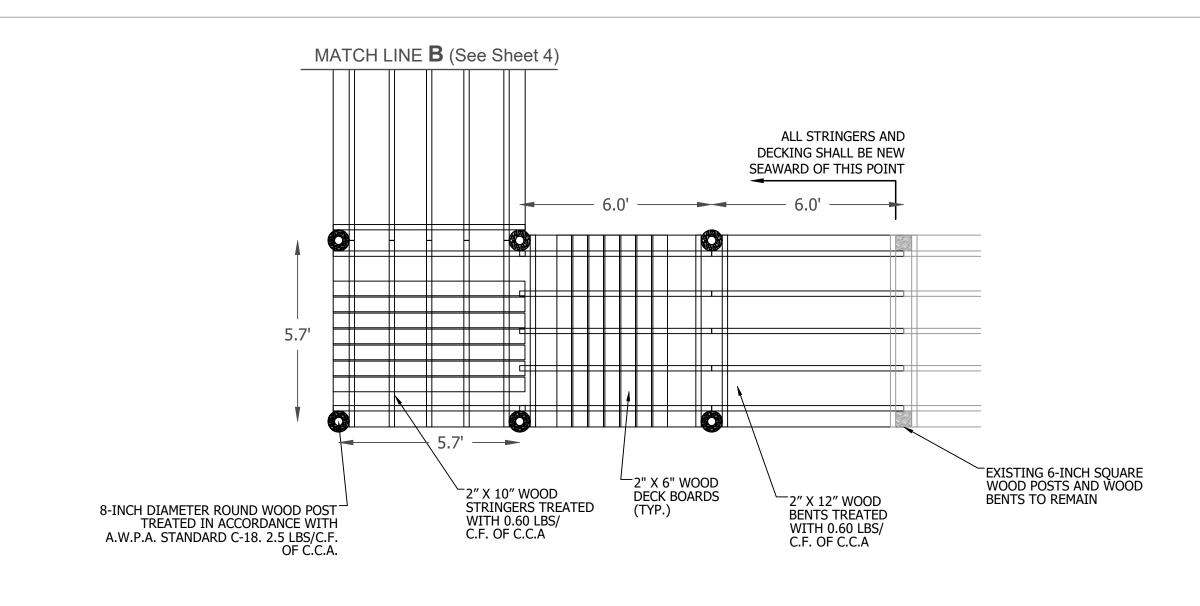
North Dune Crossover Elevation View - Beach Location (SOUTH VIEW)
